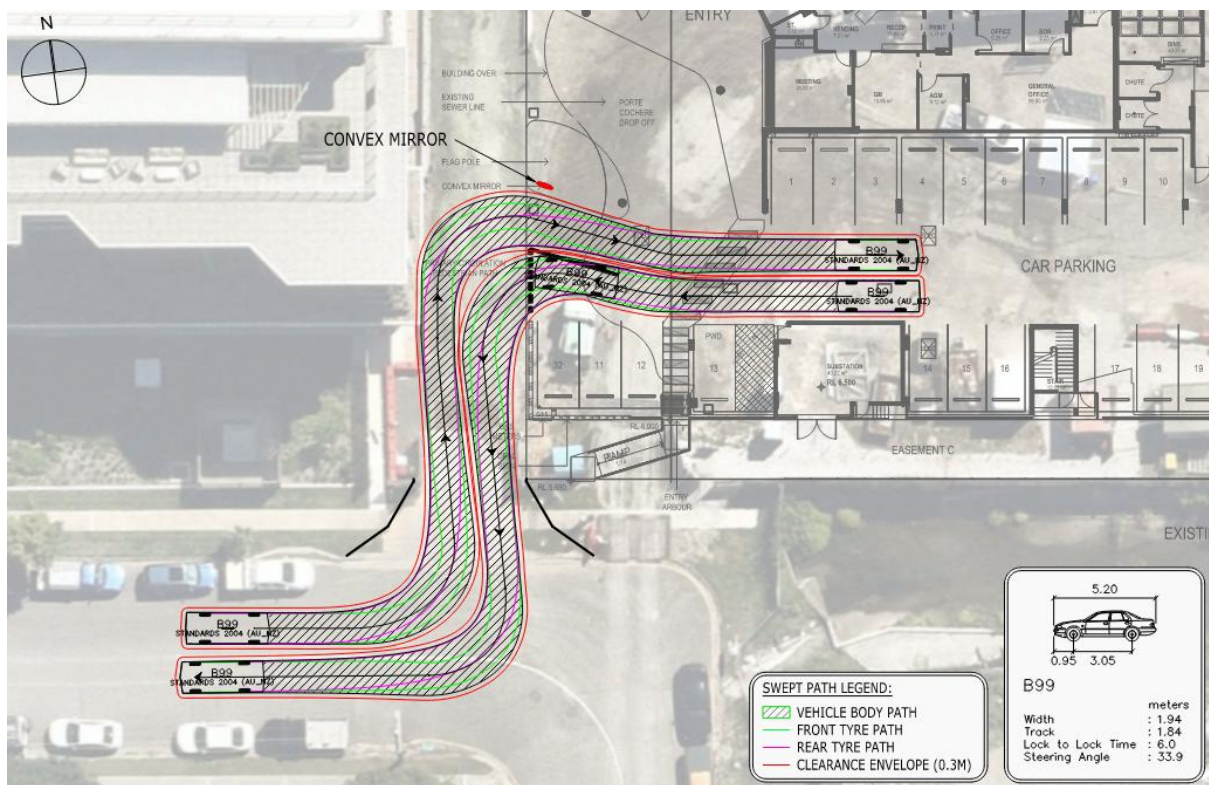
B99 Swept path access and egress adjoining new substation (Source: PTT)
